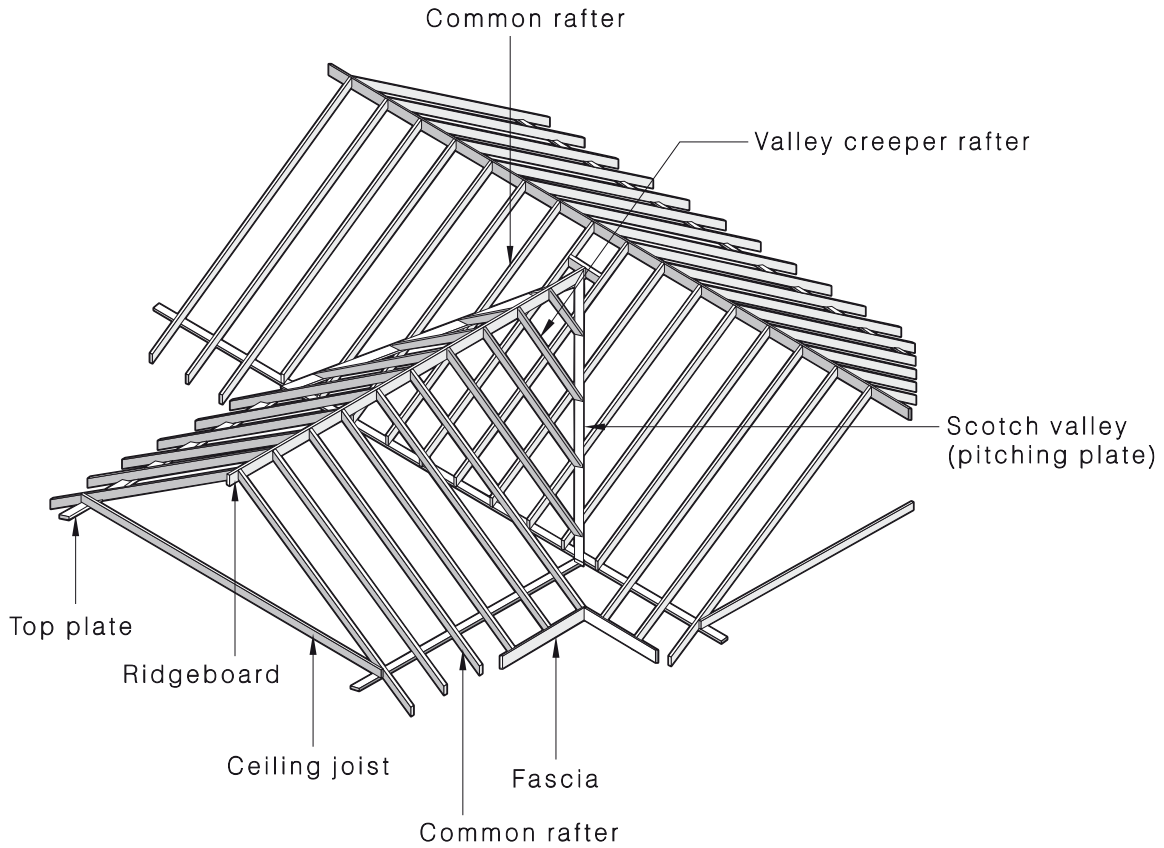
FRAMING MEMBERS—GABLE ROOF CONSTRUCTION
